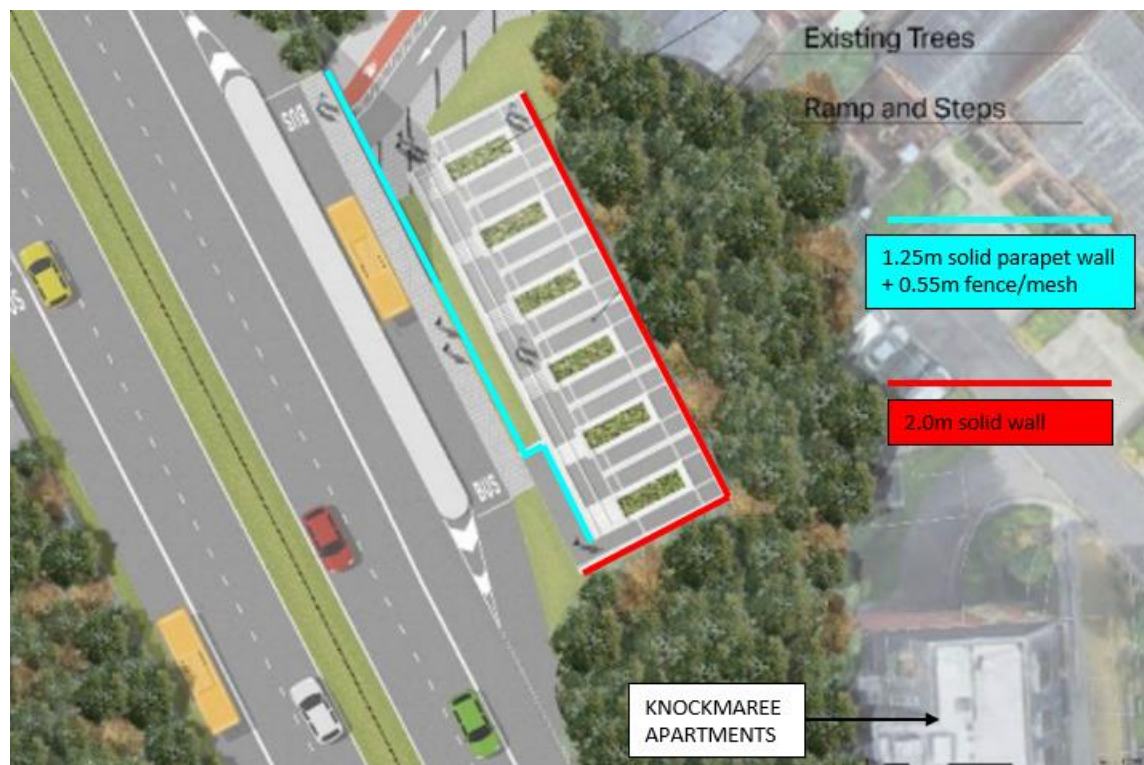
Proposed Walls Adjacent to Knockmaree Apartments
